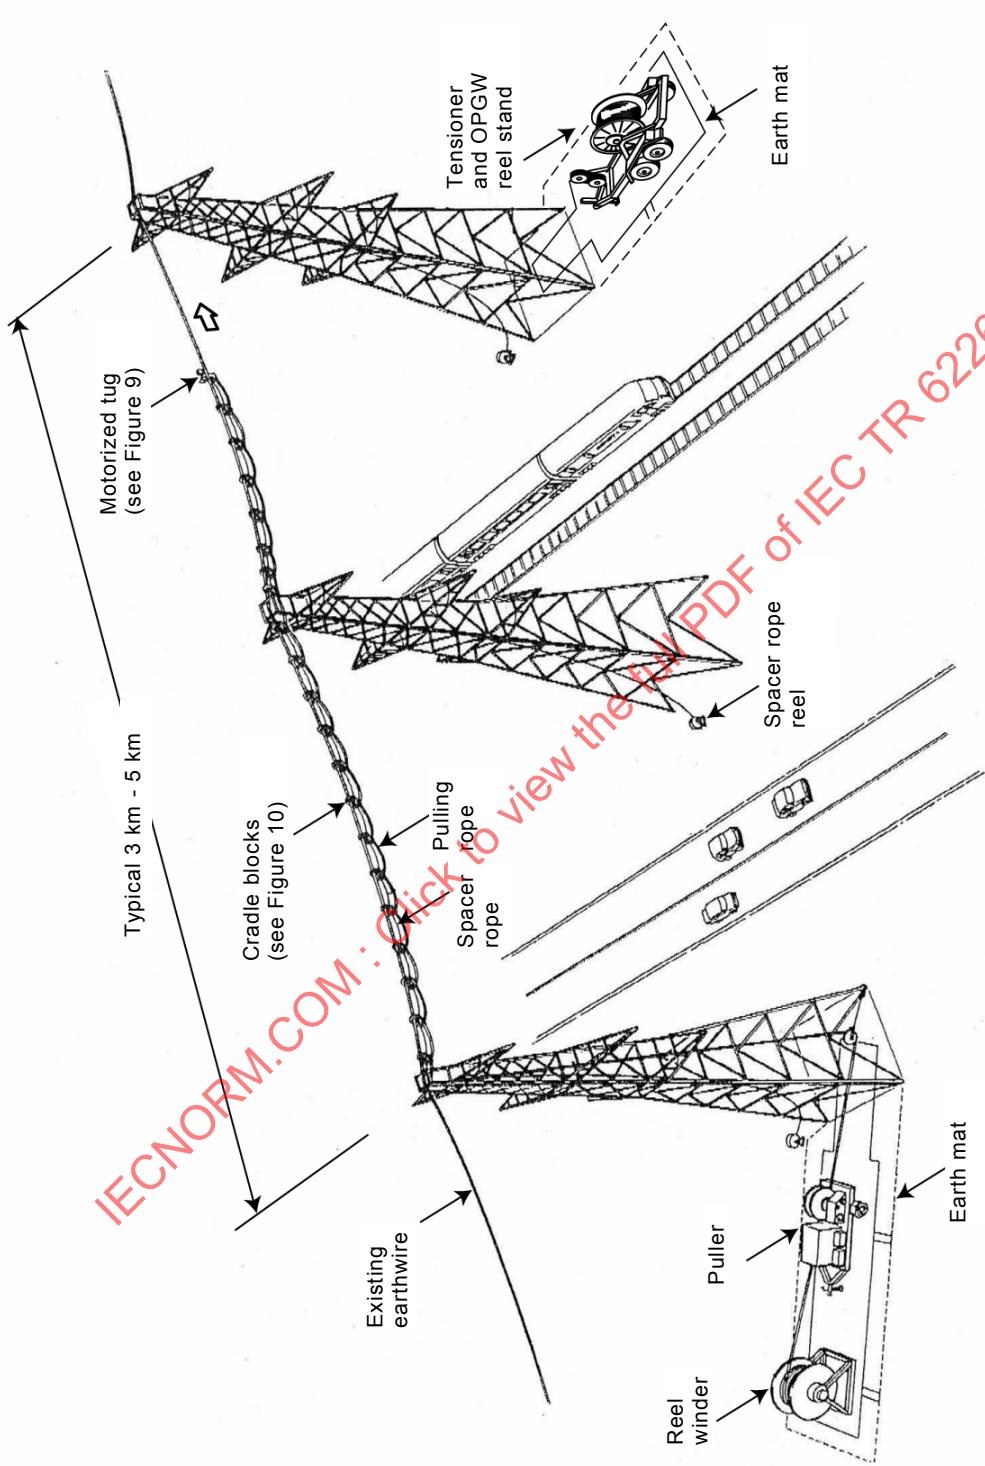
Multi-span cradle block system – General layout (see 2.7 and 5.2.2)
